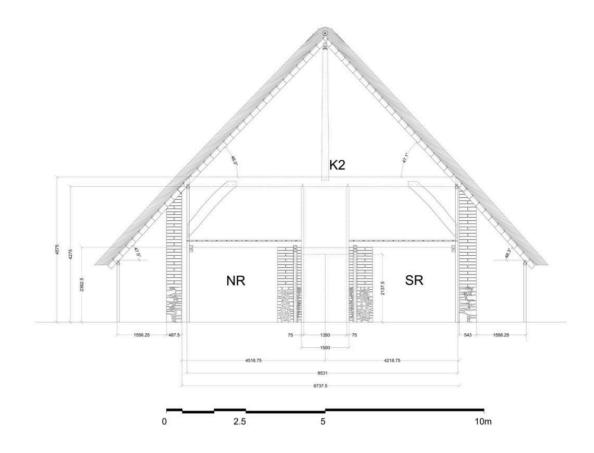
RECONSTRUCTION OF CROSS-SECTION C-C', WITH 'PROP-AND-LINTEL' OR 'POST-AND-BEAM' ROOF CONSTRUCTION AND INCLUDING THE NORTH ROOM (NR) AND SOUTH ROOM (SR). THE DETAILS OF THE WALLS ARE HYPOTHETICAL. THE POST PITS HAVE BEEN OMITTED.
